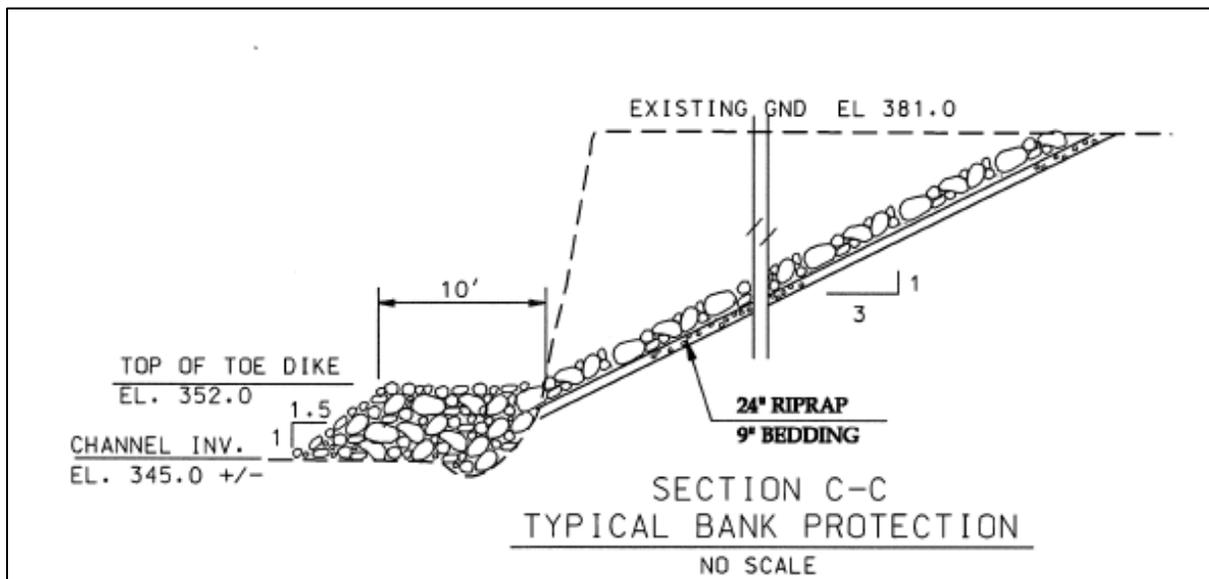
Existing Streambank Protection Project Typical Cross-section
